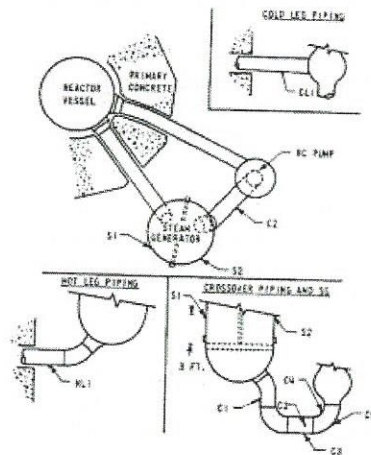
Typical Westinghouse 4-Loop Plant With Piping and Steam Generator Survey Points Marked.
